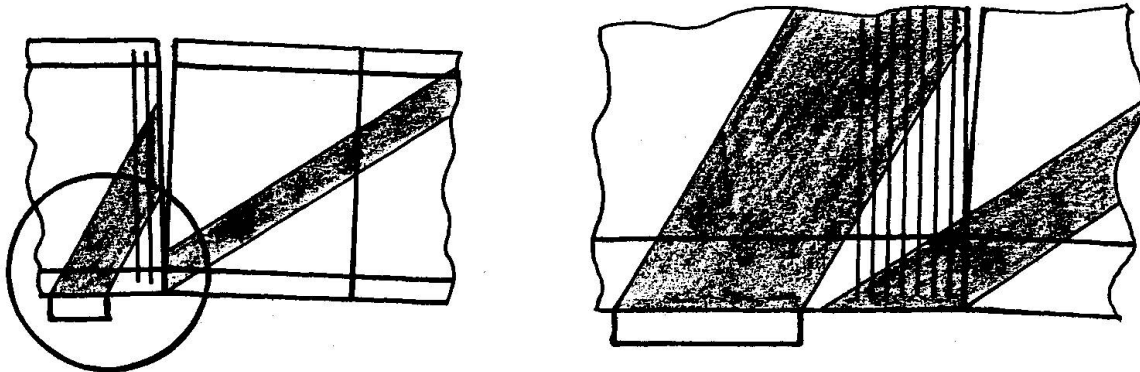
Transfer of shear force from the open joint to the support, and the necessary reinforcement
